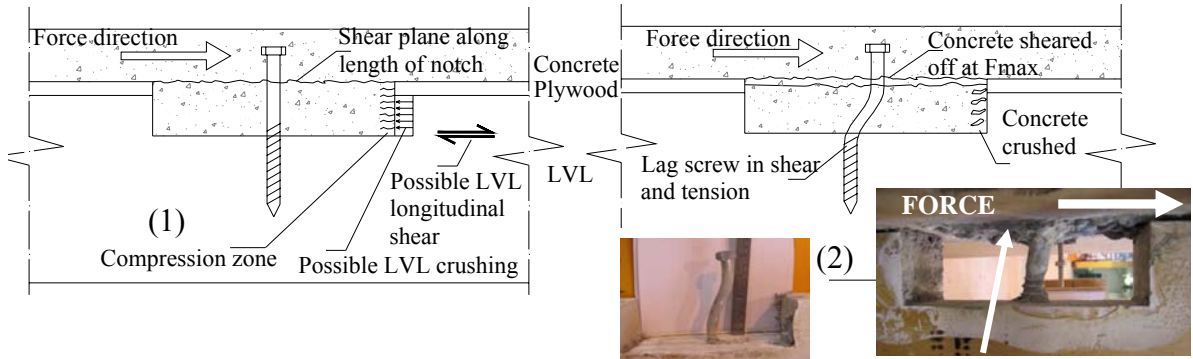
Experimental failure mechanisms and behaviour of a rectangular notch connection reinforced with a lag screw
